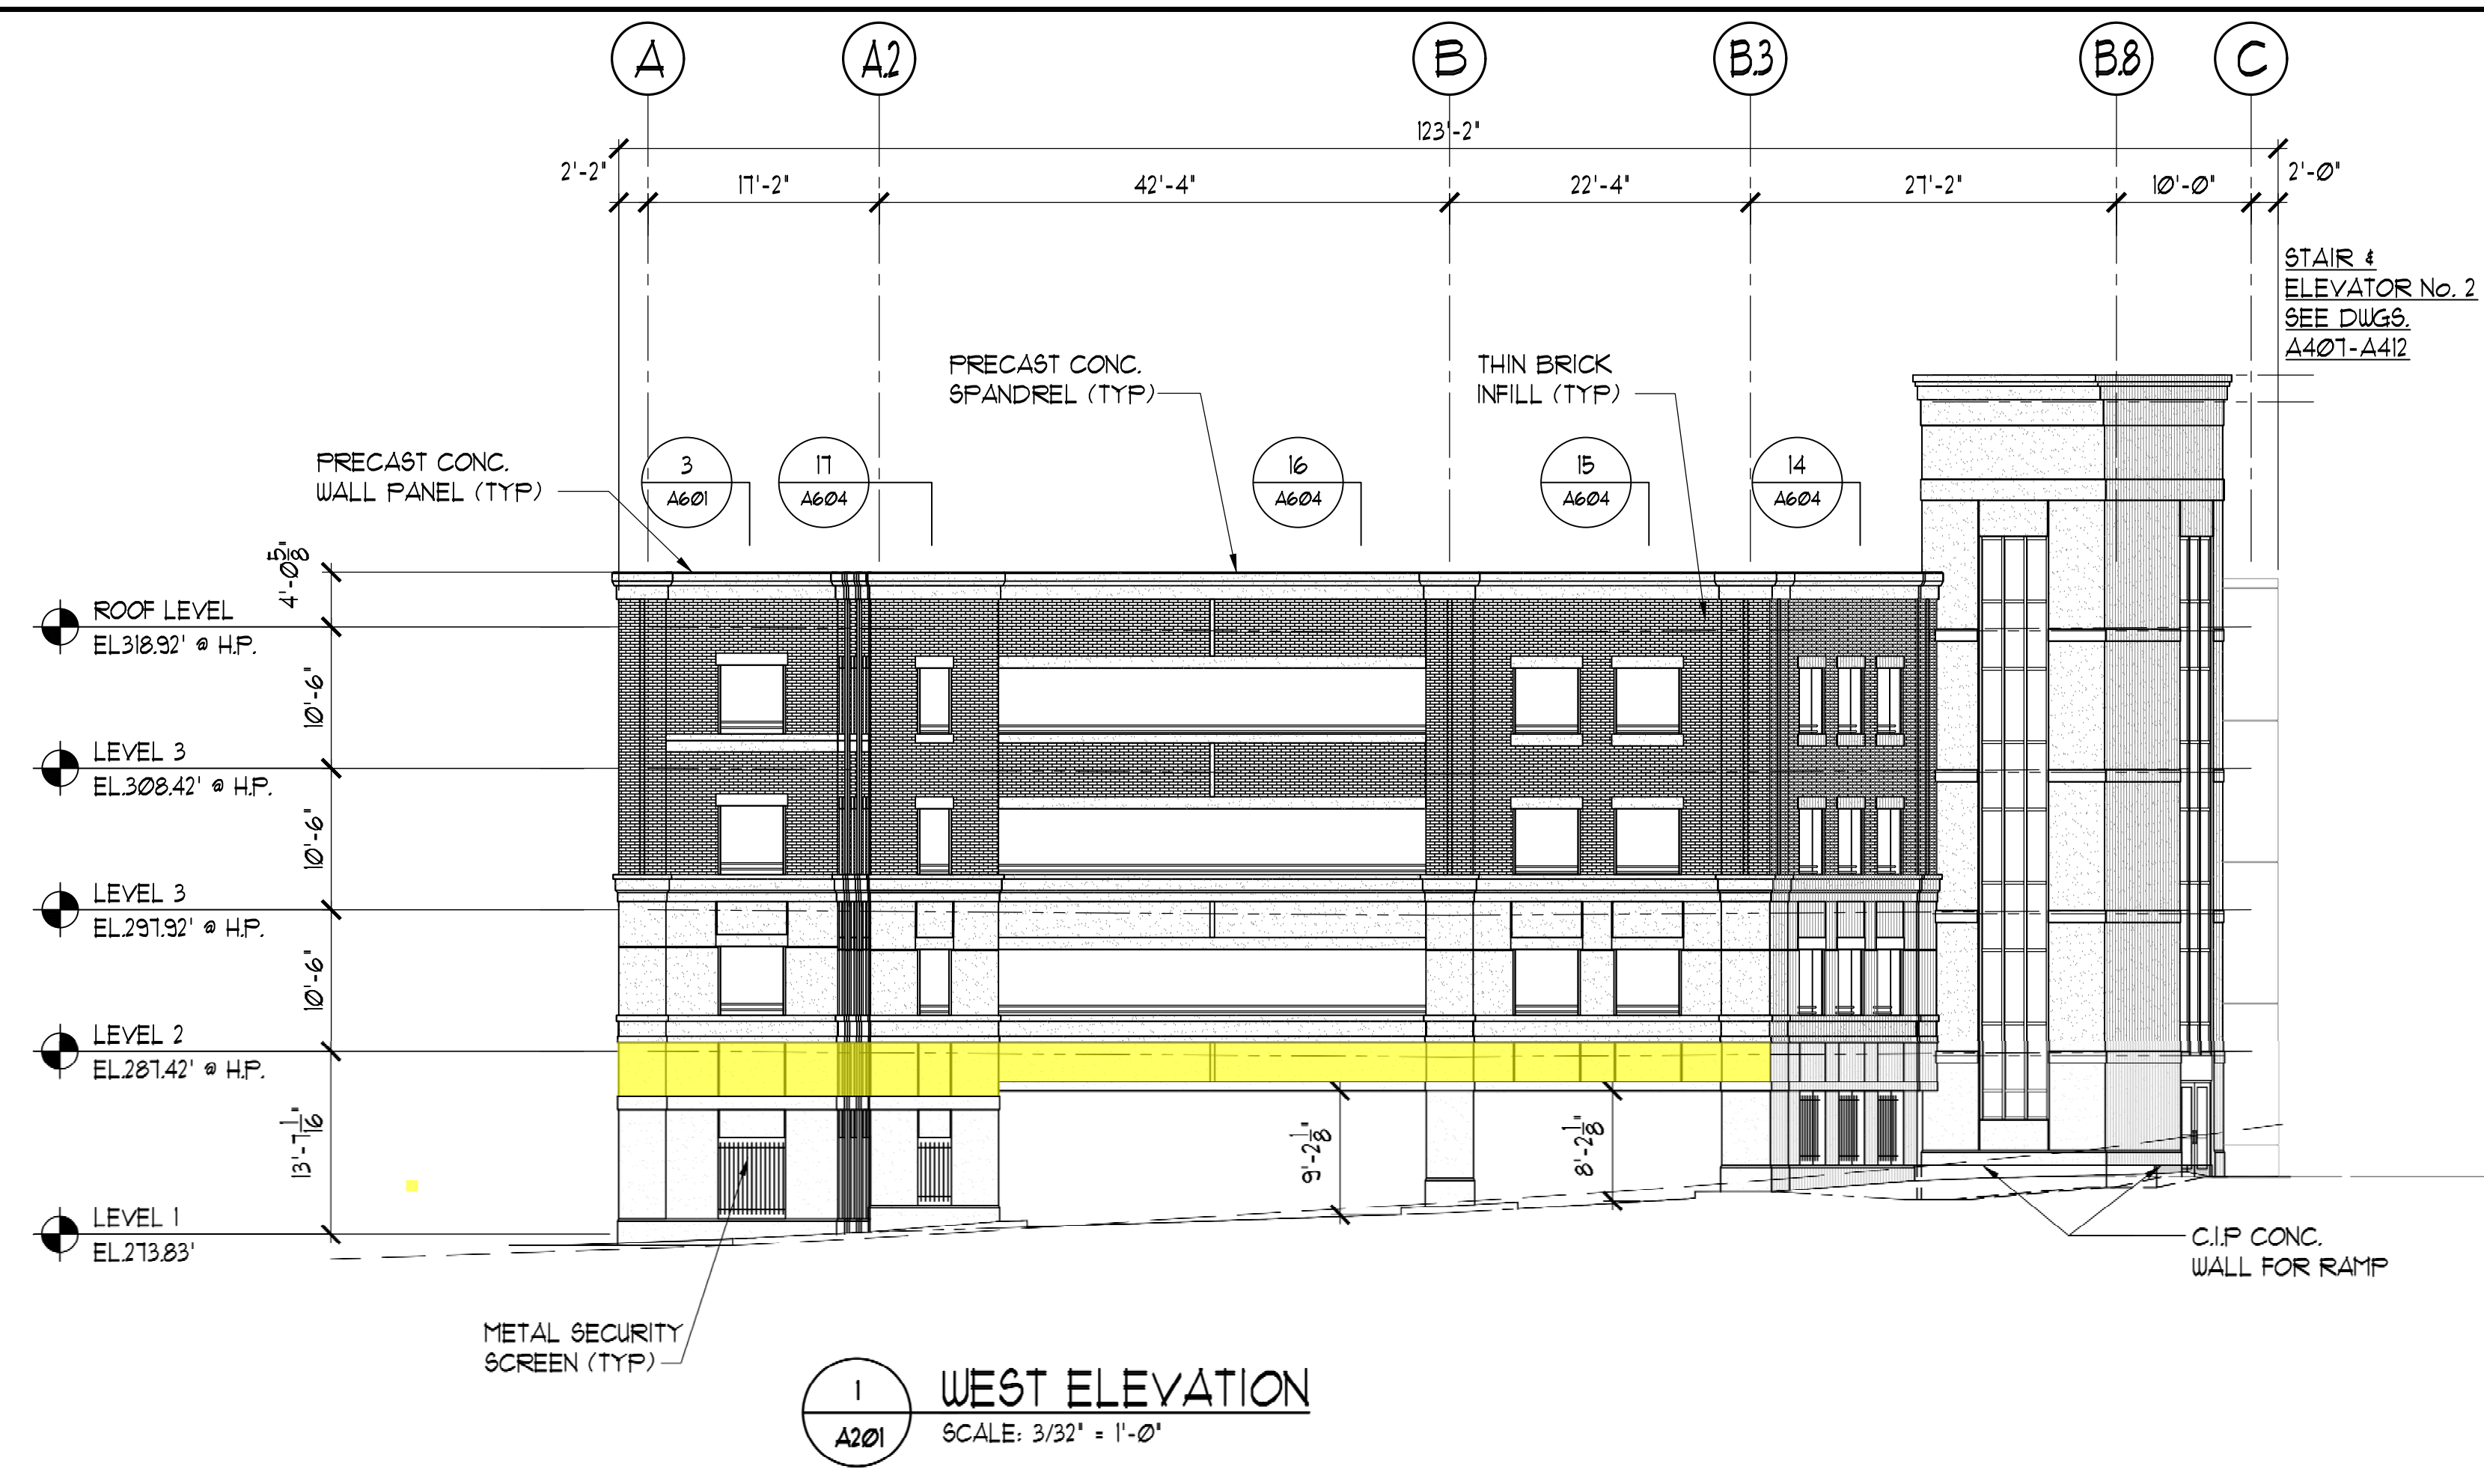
## EXHIBIT B – ARCHITECTURAL ELEVATIONS
